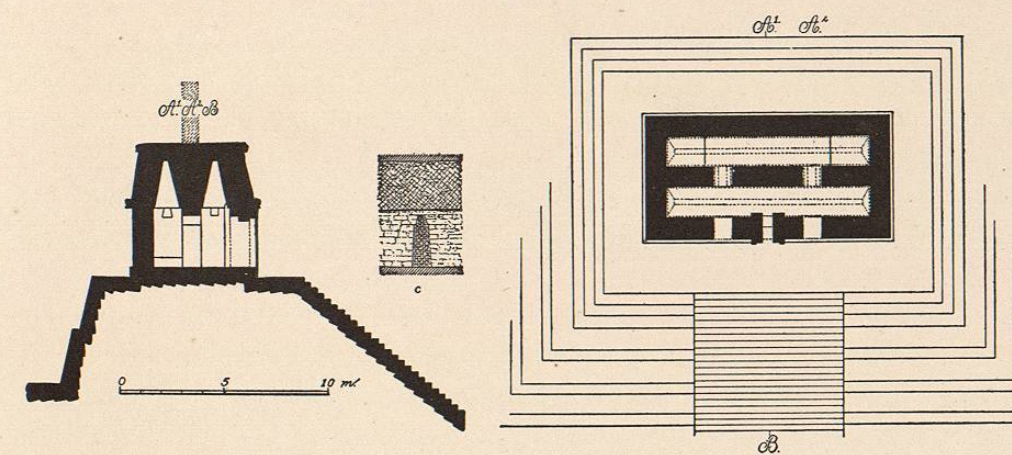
STRUCTURE 30: SECTION AND GROUND-PLAN (RESTORED).
